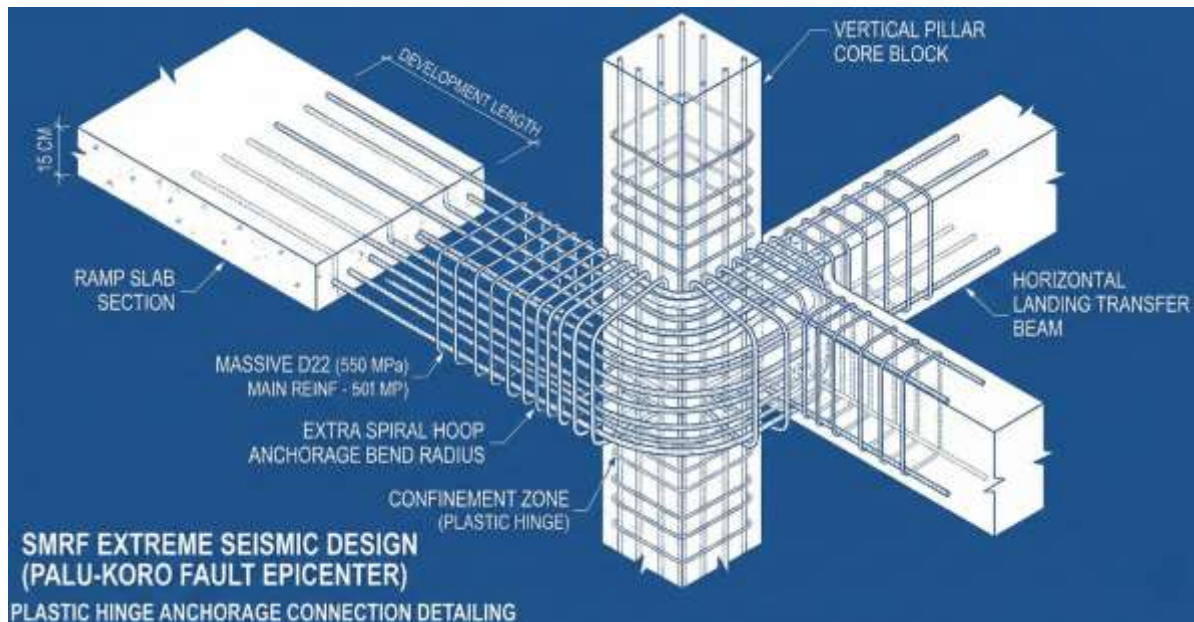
Macro-detail construction modelling of the development length of high-yield steel reinforcement bars at the nodal point of a monolithic ramp plate joint transition supported by a beam structure
